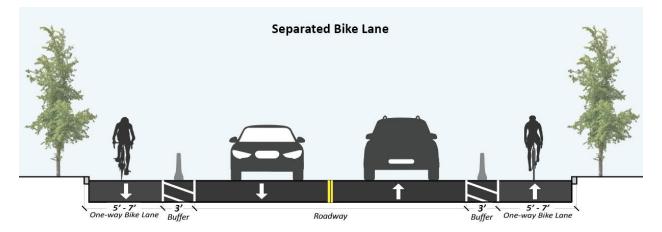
Example cross-section of a preferred separated bike lane facility
